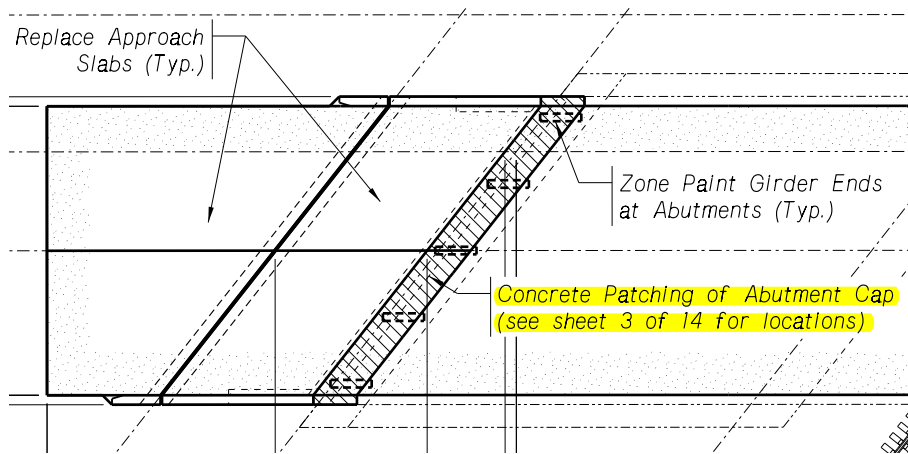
Concrete Patching Callout on General Plan (example taken from S030 42623R, CN 22688, 2019)
